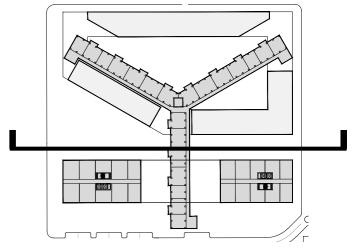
Building Setbacks - Horace Petty North West B Quadrant
